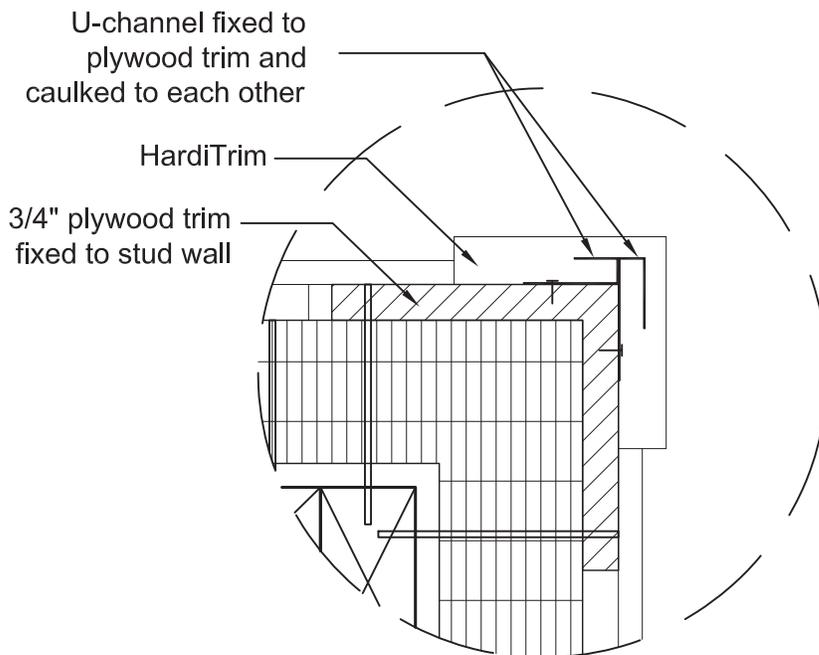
DETAIL C: Overhang Over Clerestory | Scale 1 1/2" = 1'-0"
